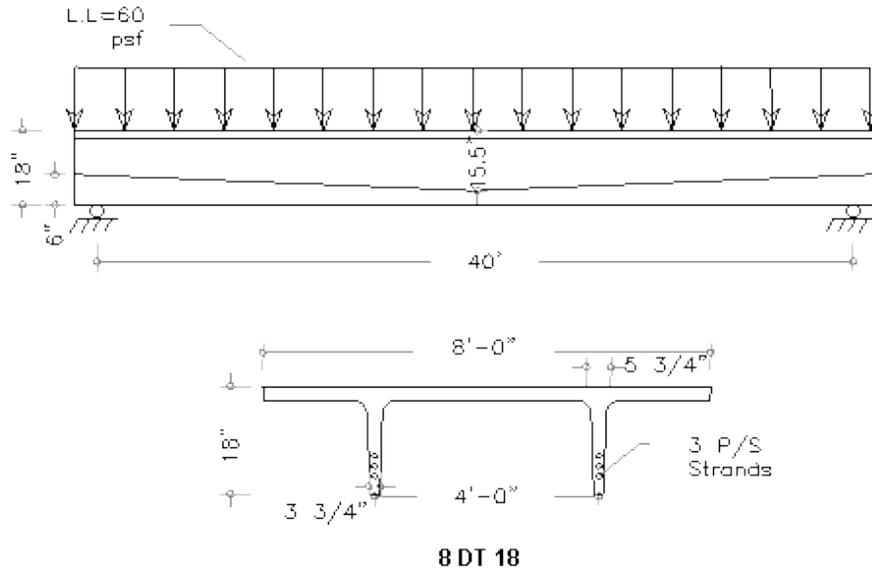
Profile and cross-section at mid-span of normal strength, simply supported, Double-T (8DT18) pre-stressed concrete member
